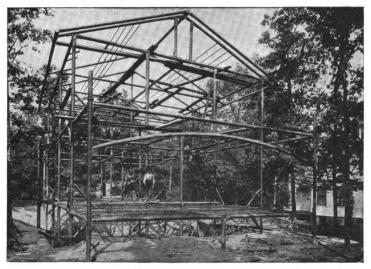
View of Skeleton Frame Made of Steel Tubing.
